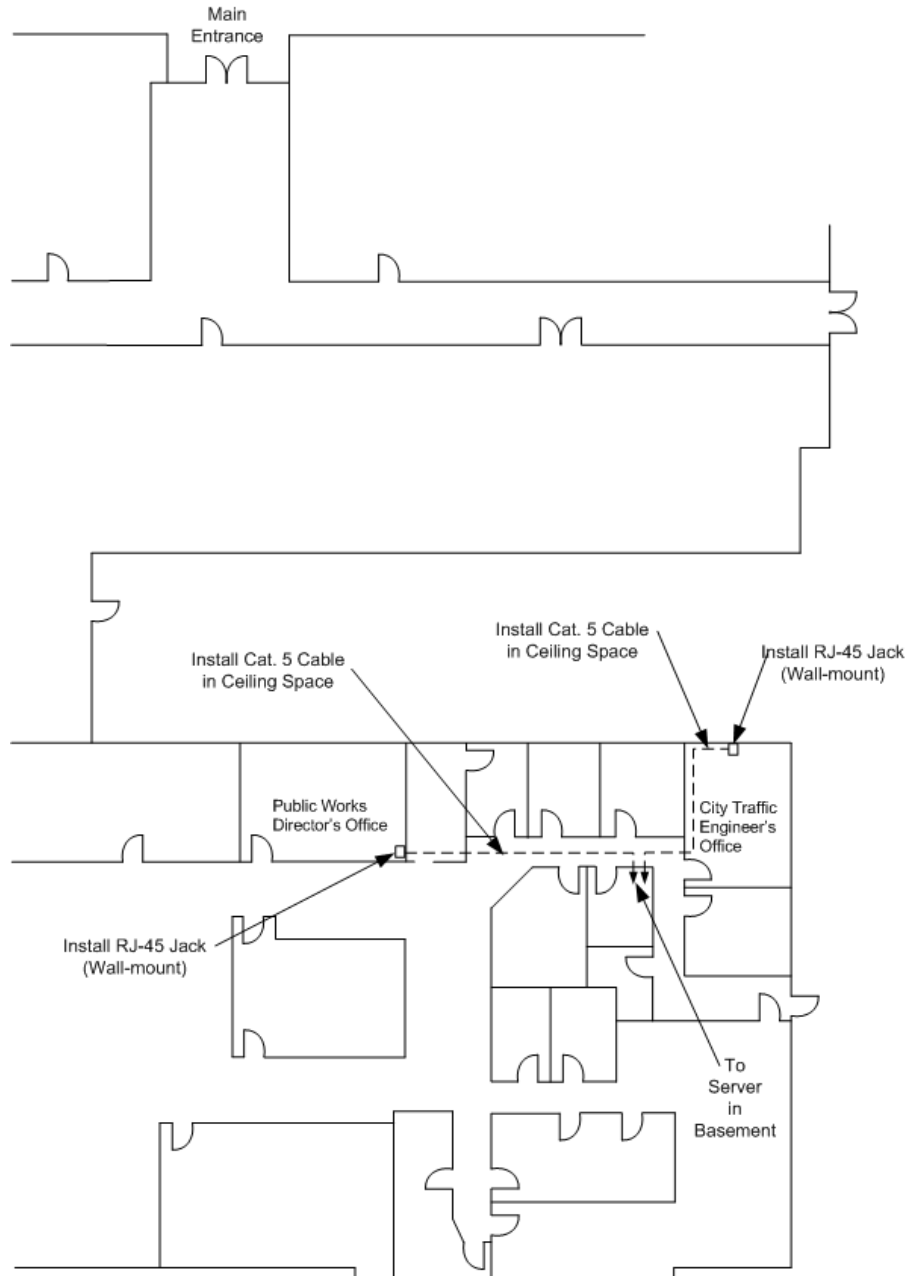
City Hall Floor Plan (Secondary LCC)
